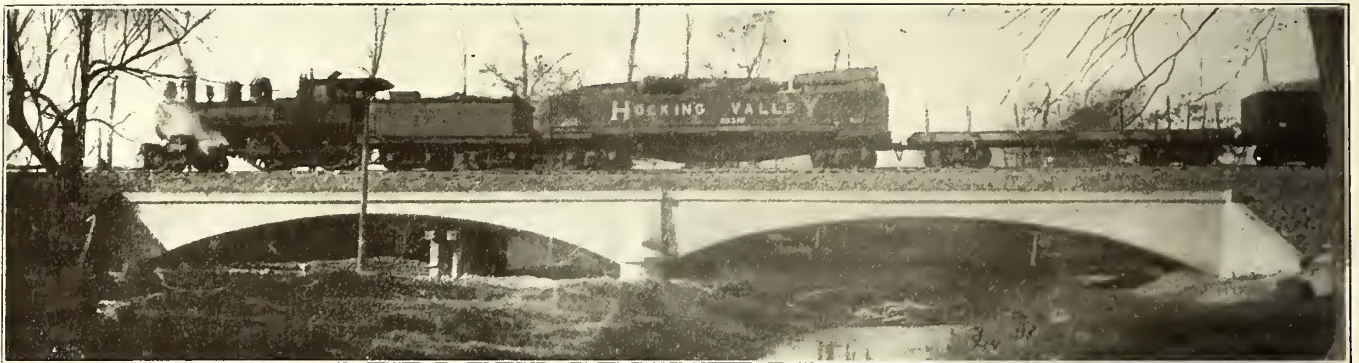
Bridge Reconstruction on Columbus & Lake Michigan Railway—Two-Arch Bridge Located at Station 816 from Lima, Ohio
